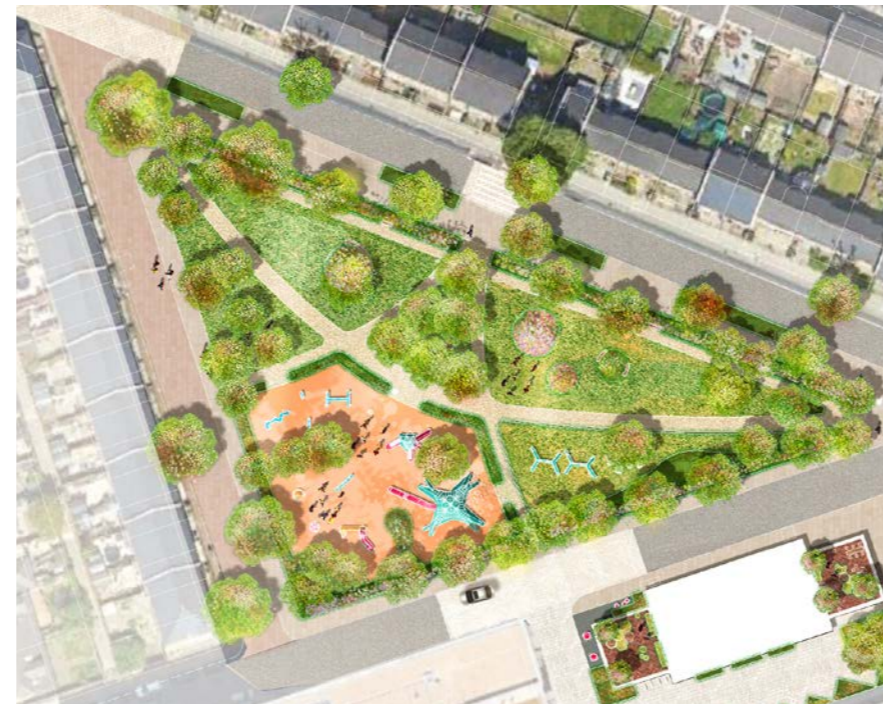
Illustrative Colour Masterplan - Braithwaite Park
